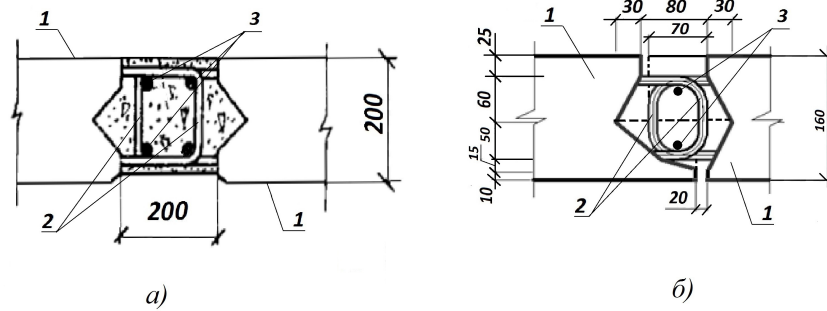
Structure of the floor slab plates connection with each other: a) the first version [9]; b) the improved version of the "CUBE 2.5" series; 1 – plate; 2 – loop starter bars; 3 – mounting hardware
